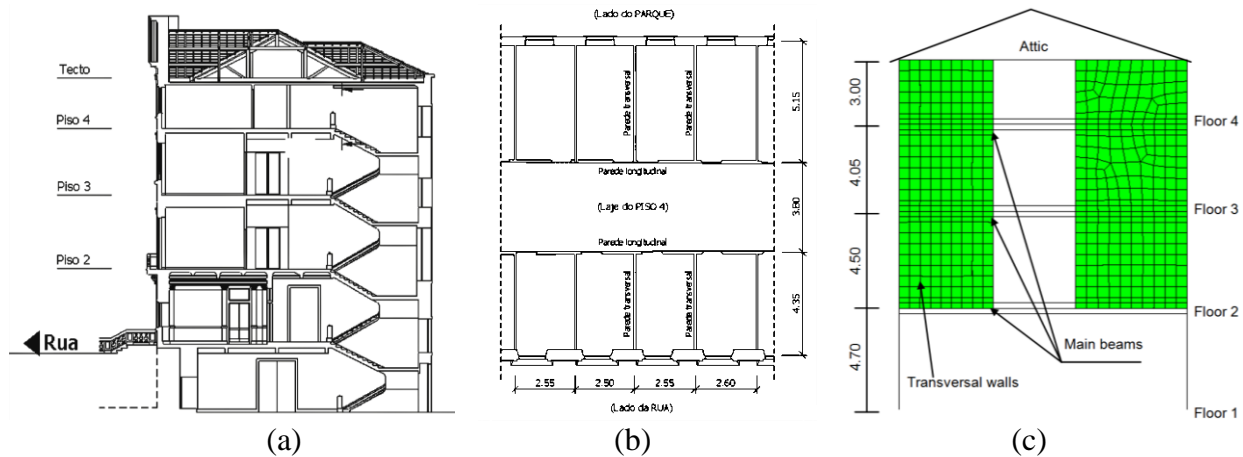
Theological school: (a) Vertical section; (b) Plan; (c) Main transversal structure.
